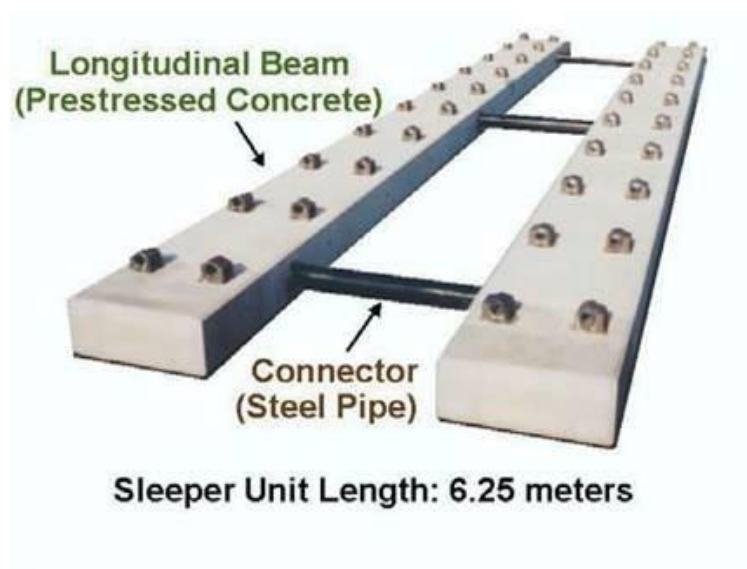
Floating ladder track (Railway Technology Avalanche (2004))
